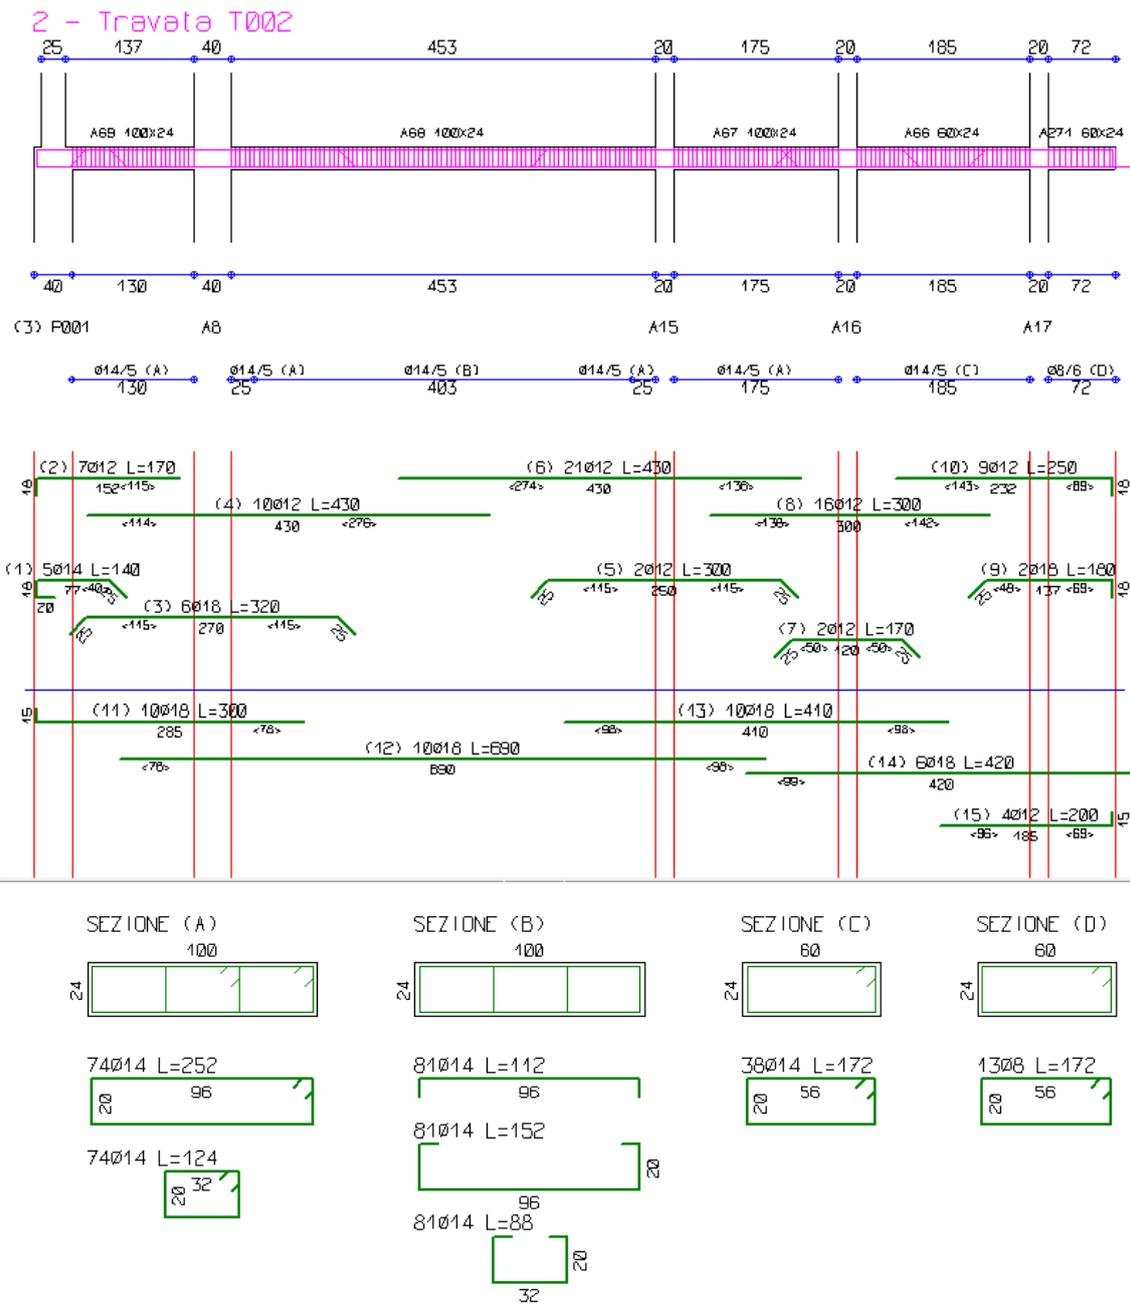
Design Reinforcement T002 (DOLMEN)
